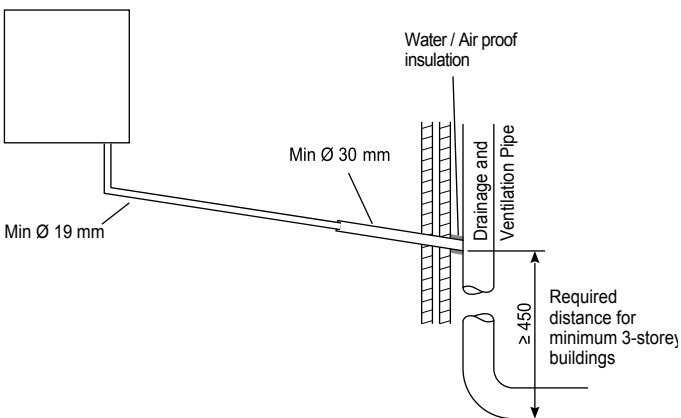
Connection of Condensate Drainage to Drainage and Ventilation Pipe
